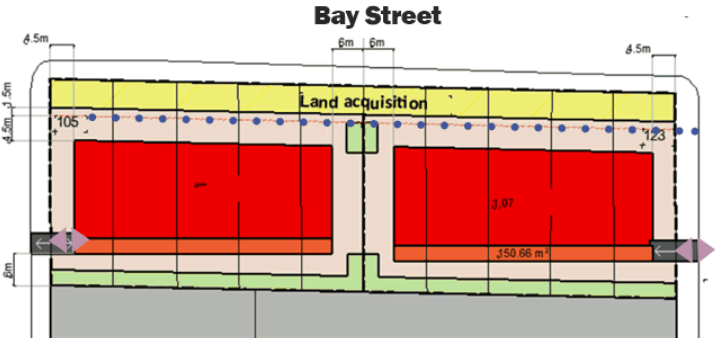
PROPOSED BUILT FORM PLAN
